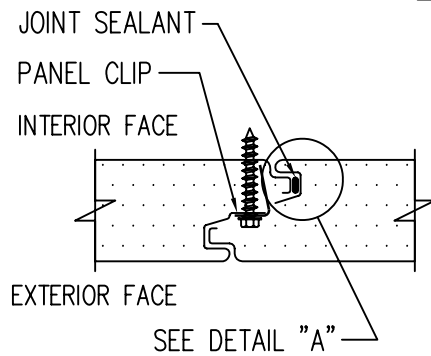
DETAIL AT WALL SPLICE WITH COLD FORMED MEMBER
